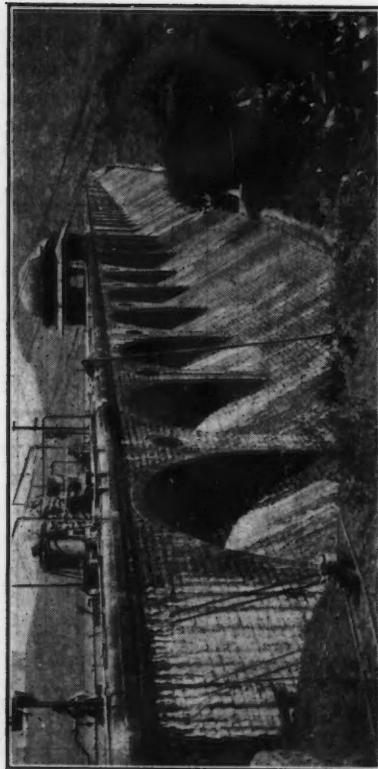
VIEW OF CEMENTATION PUMPS AND GATE-HOUSE, WALWHAN DAM.
